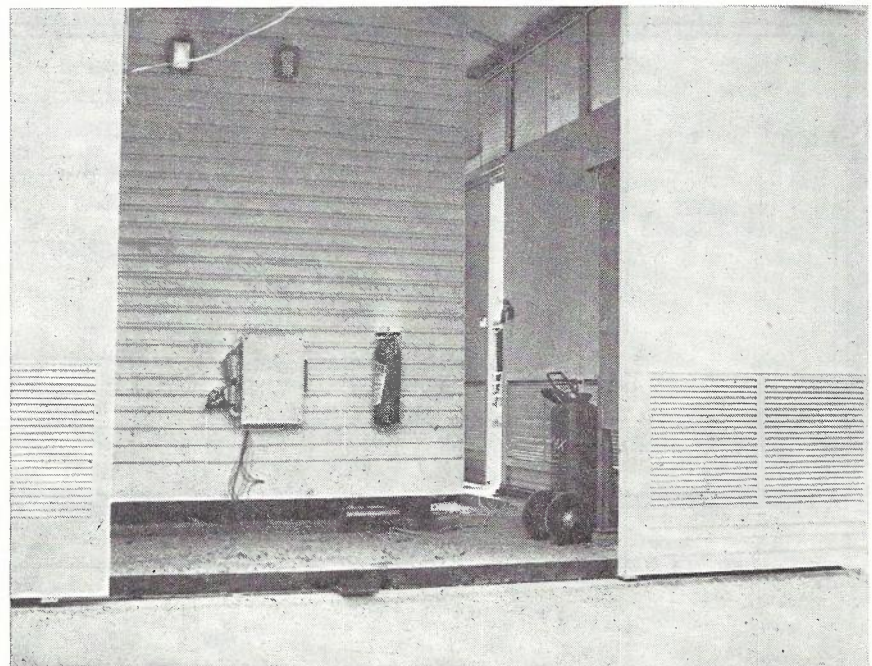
End View, Doors Open, Showing Diesel Enclosure and Inner Shell.
